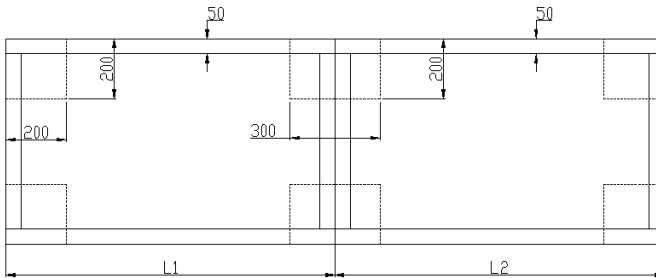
Frame for air-handling unit consisting of several monoblocks
